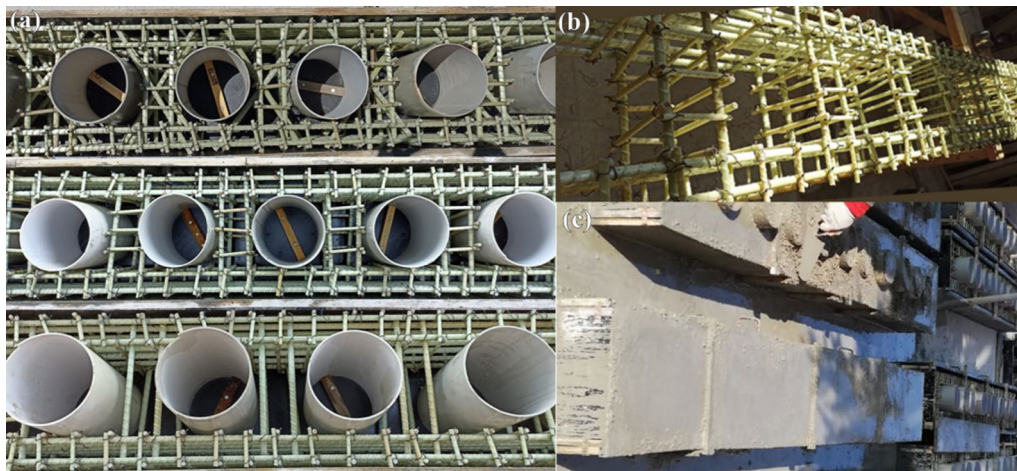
Preparation stages of the test specimens: a reinforcement details, b reinforcement skeleton, c batching concrete
